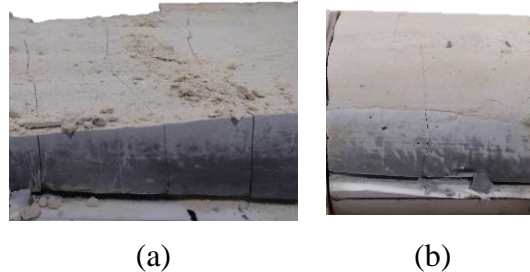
Shrinkage cracks: (a) Normal grout; (b) Soft grout
